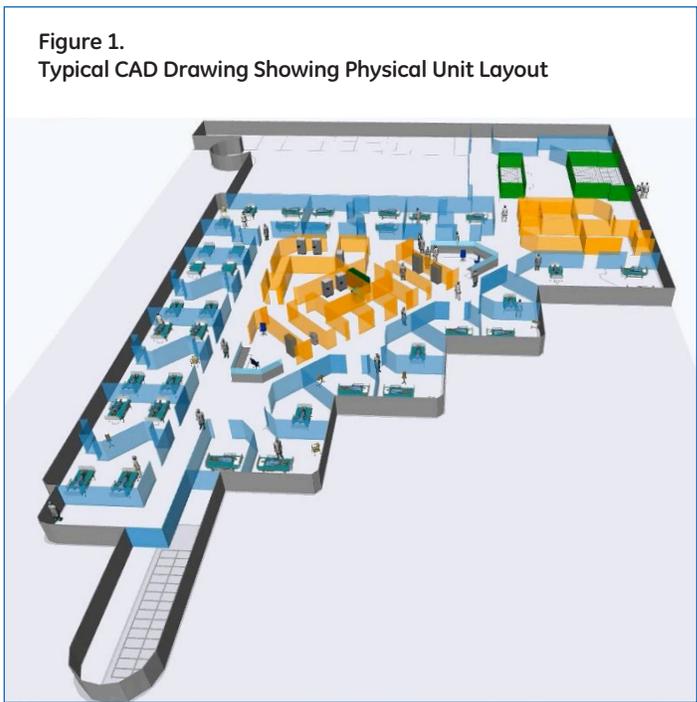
Typical CAD Drawing Showing Physical Unit Layout
